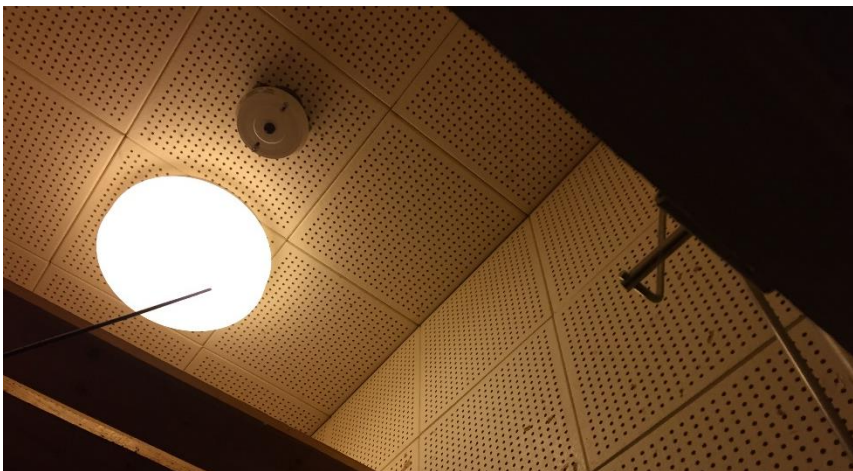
View of non-asbestos containing acoustic ceiling tile in Room 307.
